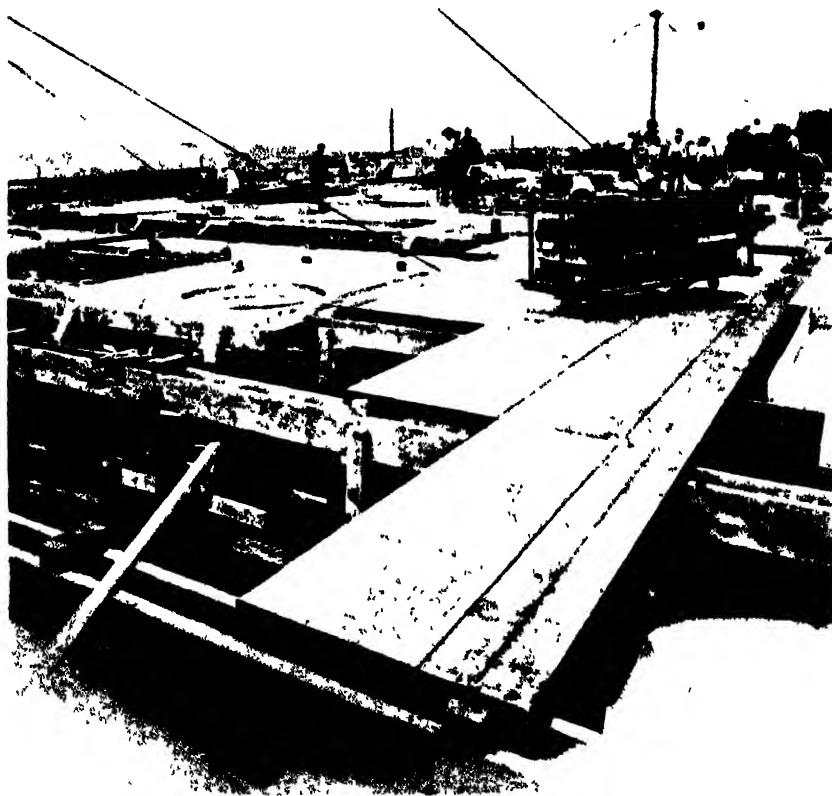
BLAW-KNOX SYSTEM OF STEEL DECK FORMS
